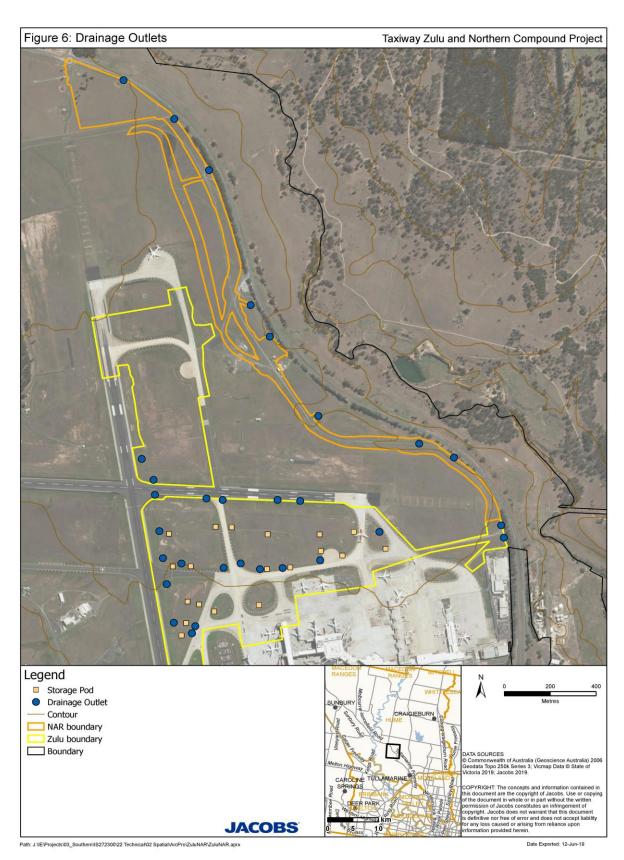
Showing the surface water drainage outlets for NAR and Zulu (actually pit inlets). The proposed contaminated pod locations for Zulu are shown beside the drainage outlet.
